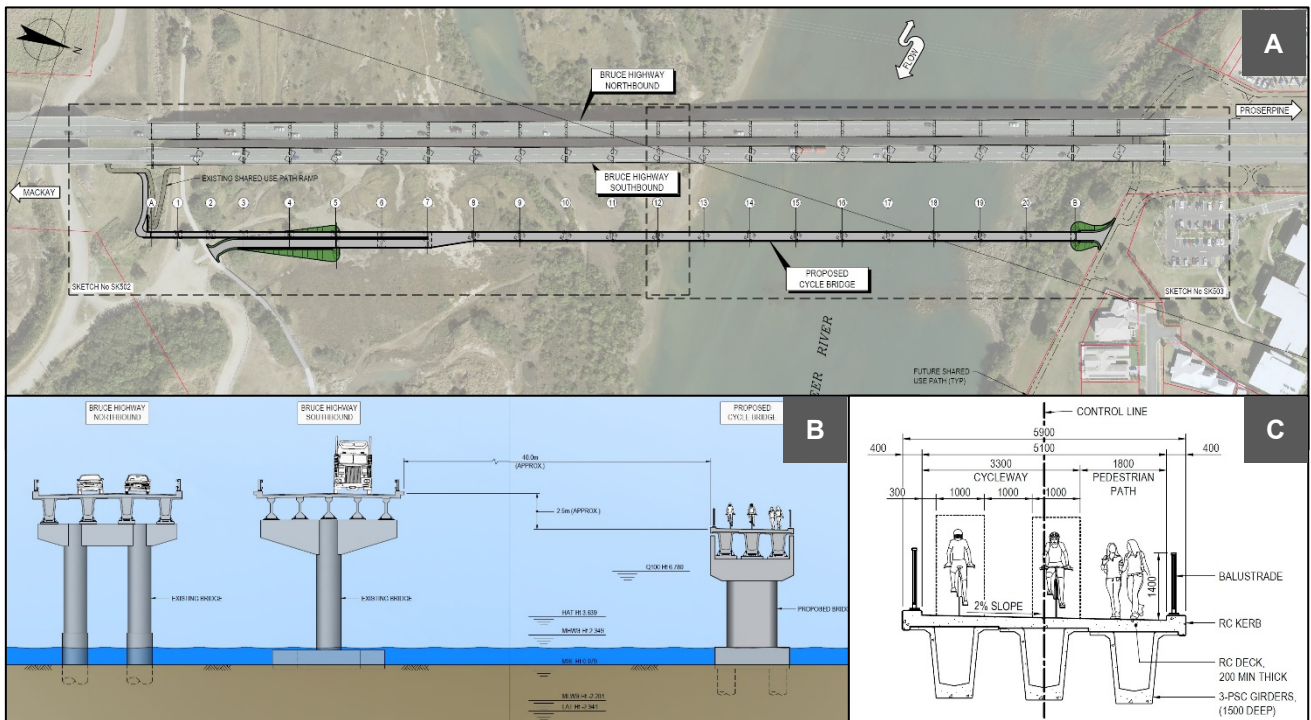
Bruce Highway Bikeway Bridge concept plan and cross-sections
